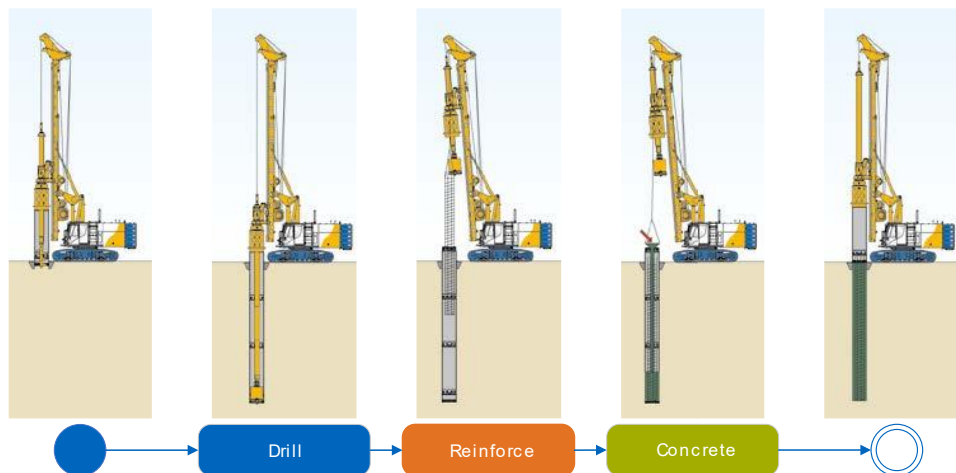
Kelly drilling process: (1) drill, (2) reinforce, (3) concrete (after image from Bauer group (2024))
